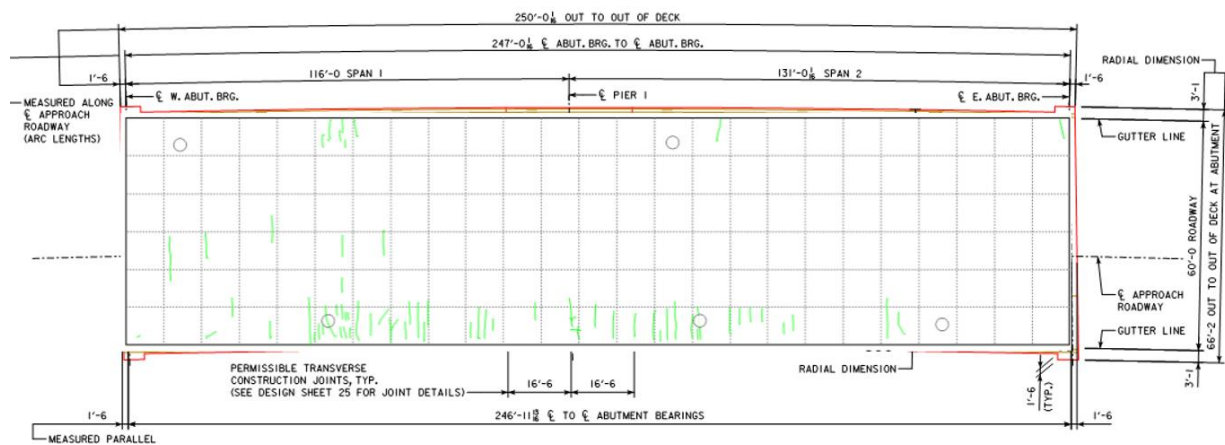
Observed early-age bridge deck cracks on a new bridge deck located on I-80 (Eastbound) at Grinnell exit to Highway 146.
